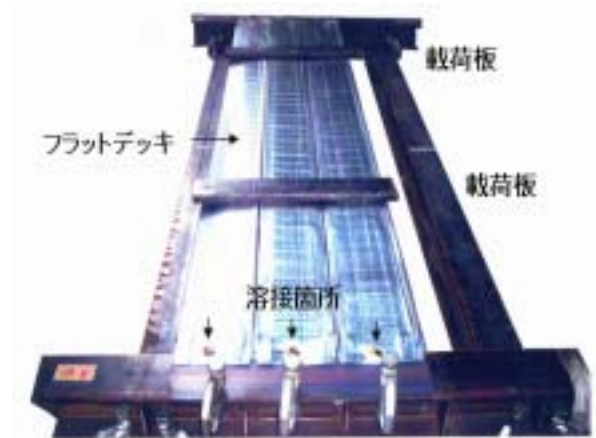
Welded parts on attached iron plate and end-clamps
